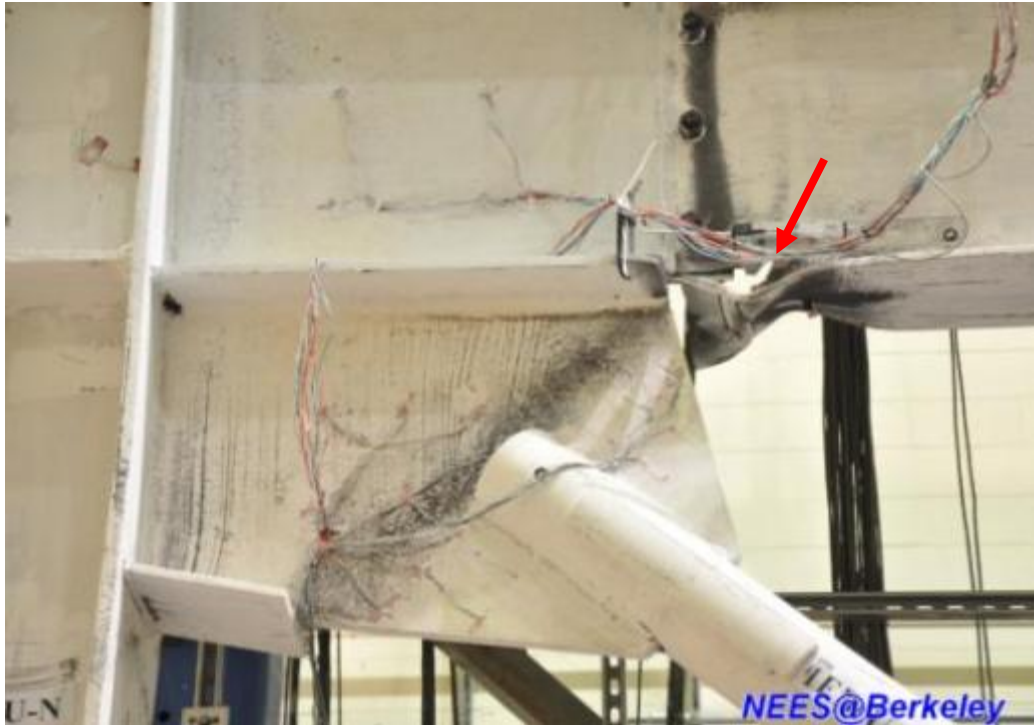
Specimen TCBF-B-2: crack propagation into web at east-side lower beam.
